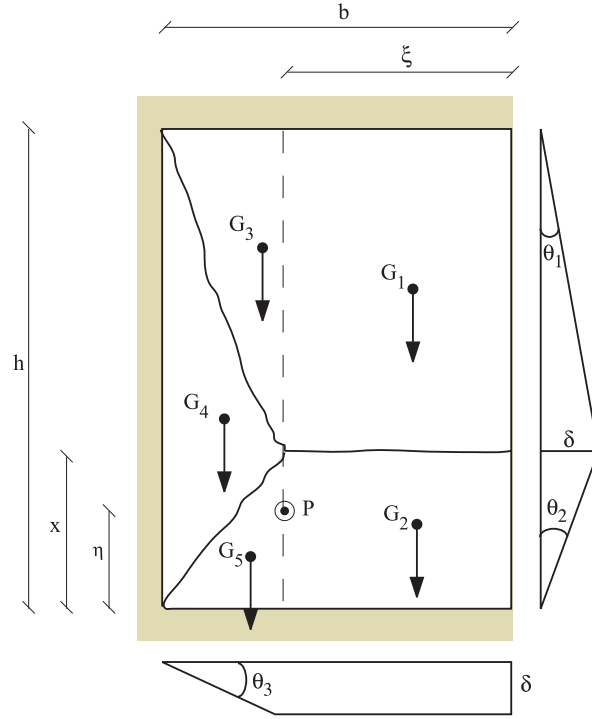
The wall strip bending failure mechanism with an additional vertical support, [1]
